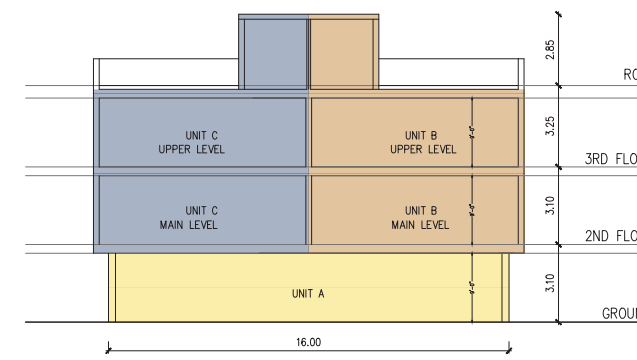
Proposed development townhouse section diagram. ICON Architects.
